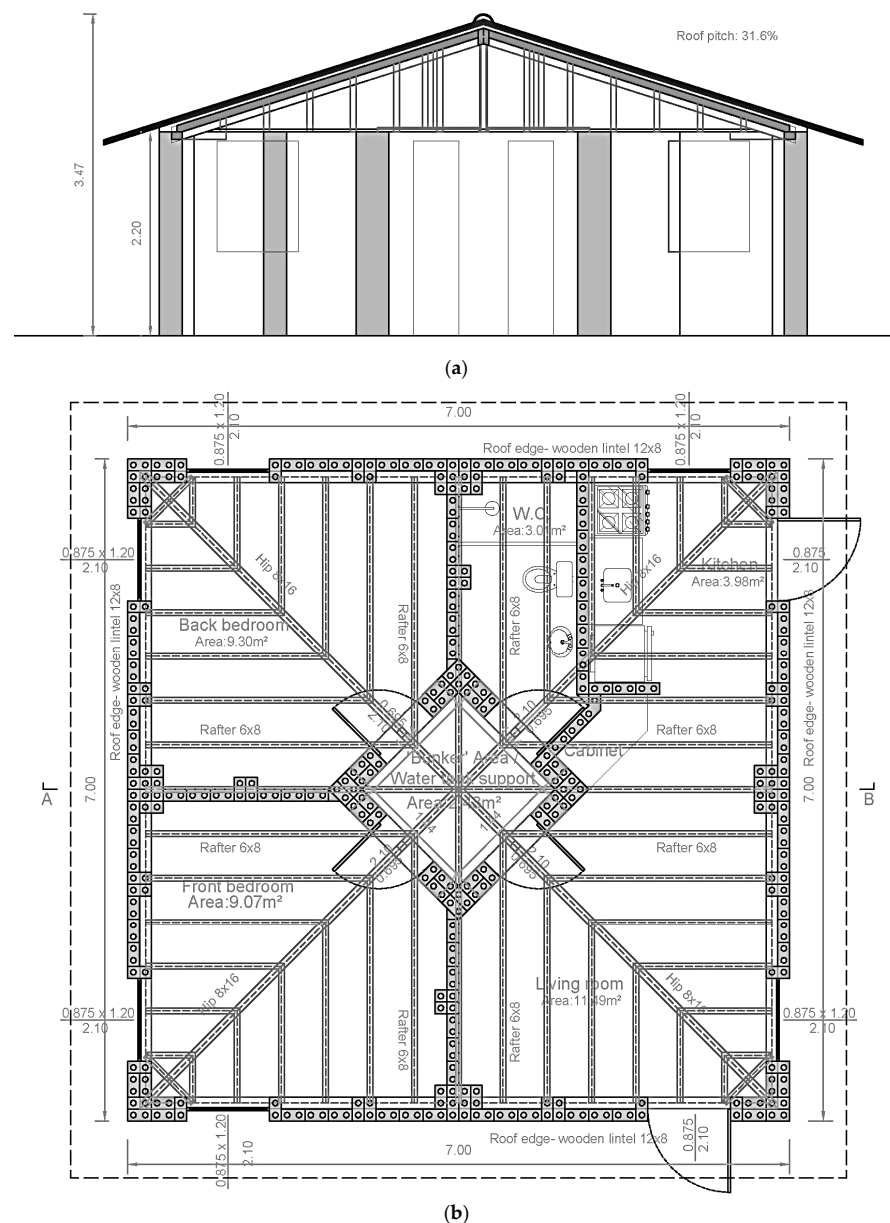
(a) Design elevation of SHS-Multirisk 2.0 model; (b) architectural floor plan. Source: [44].
